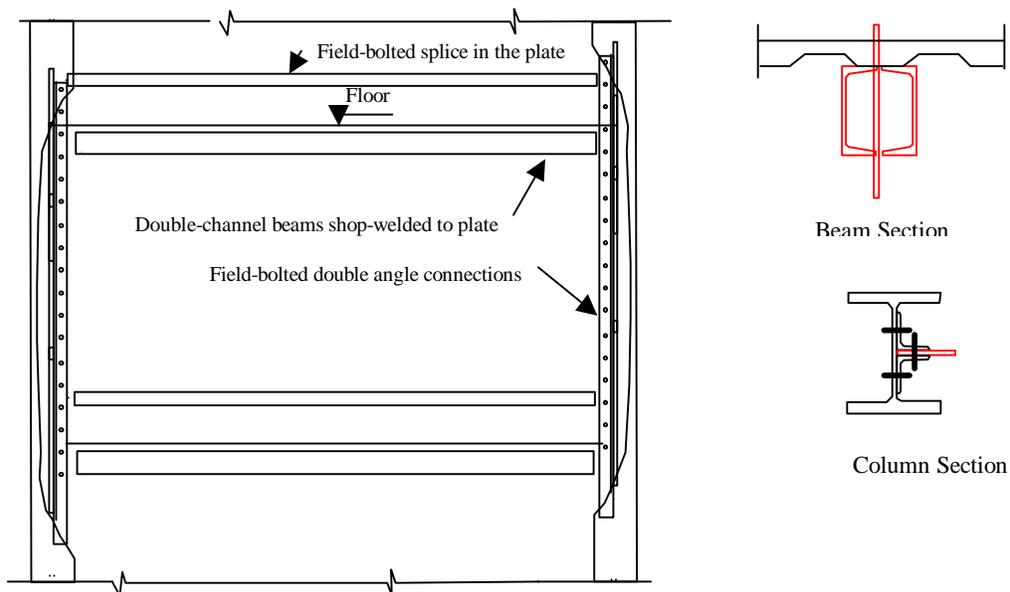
A shop-welded, field-bolted steel plate shear wall system
